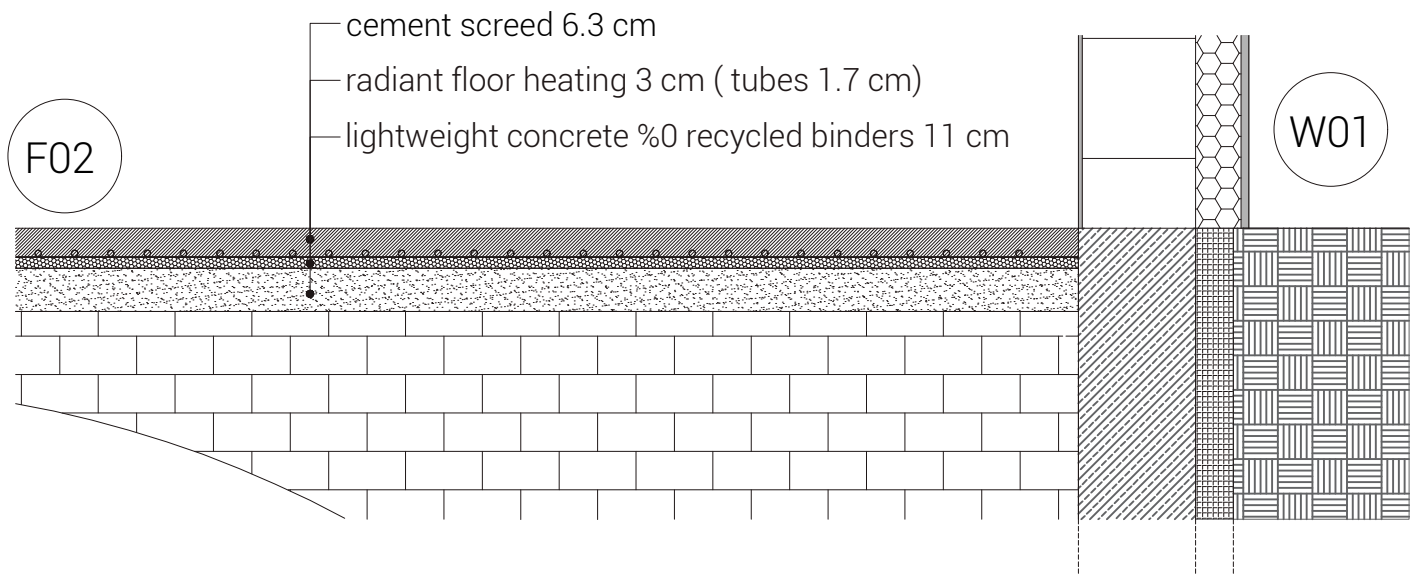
BAU FOUNDATION / GROUND FLOOR SLAB (F02)
